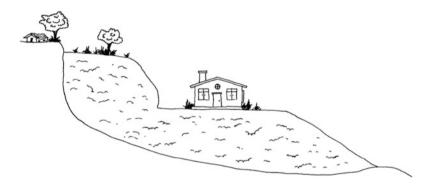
Construction of buildings in hilly areas generally alters the behavior of slopes on which they are built. The cuttings made to create space for the building construction may destabilize slope to the point of failure. Urbanization on slopes is known to impair natural drainage thereby making the slopes unsafe. Engineers take all these factors into consideration in slope engineering
